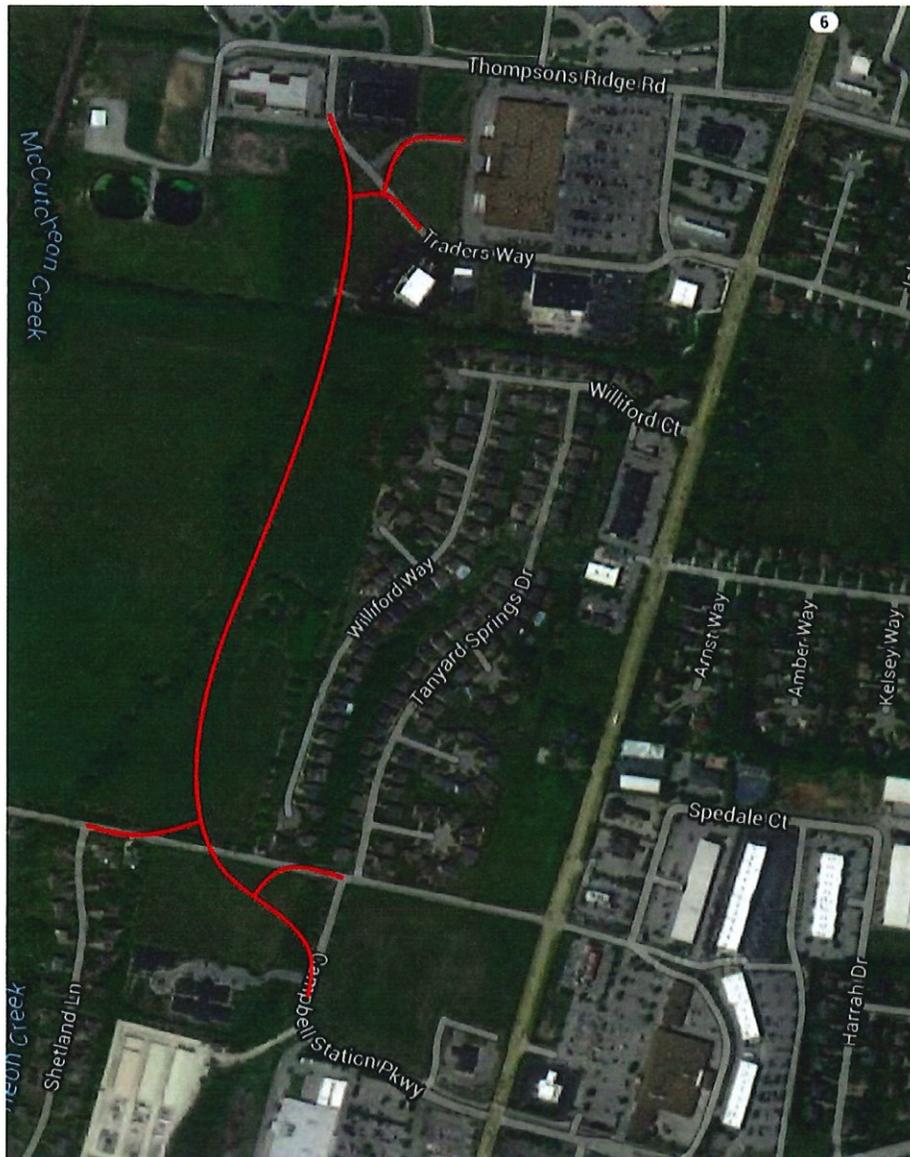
Conceptual Connector between Thompson's Ridge Road and Campbell Station Parkway.
